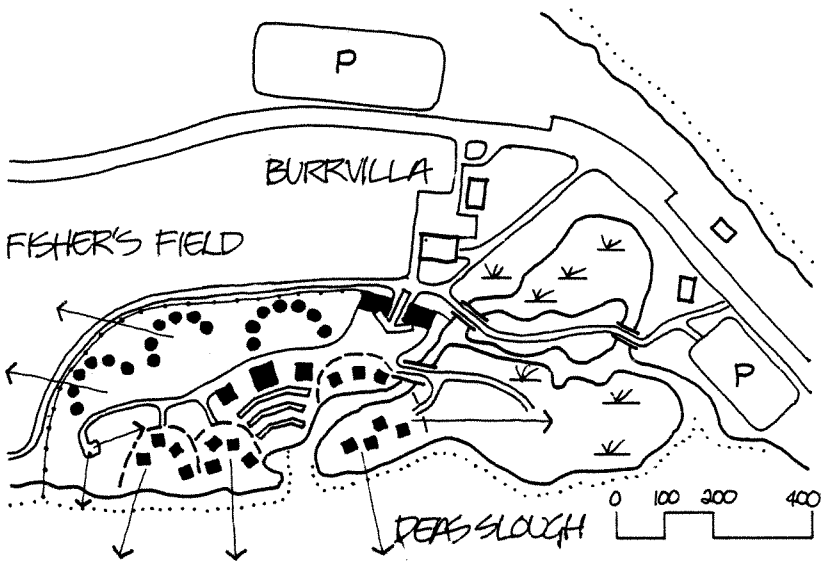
ALTERNATIVE N.I.C.C. LAYOUT ON A 10 ACRE SITE
